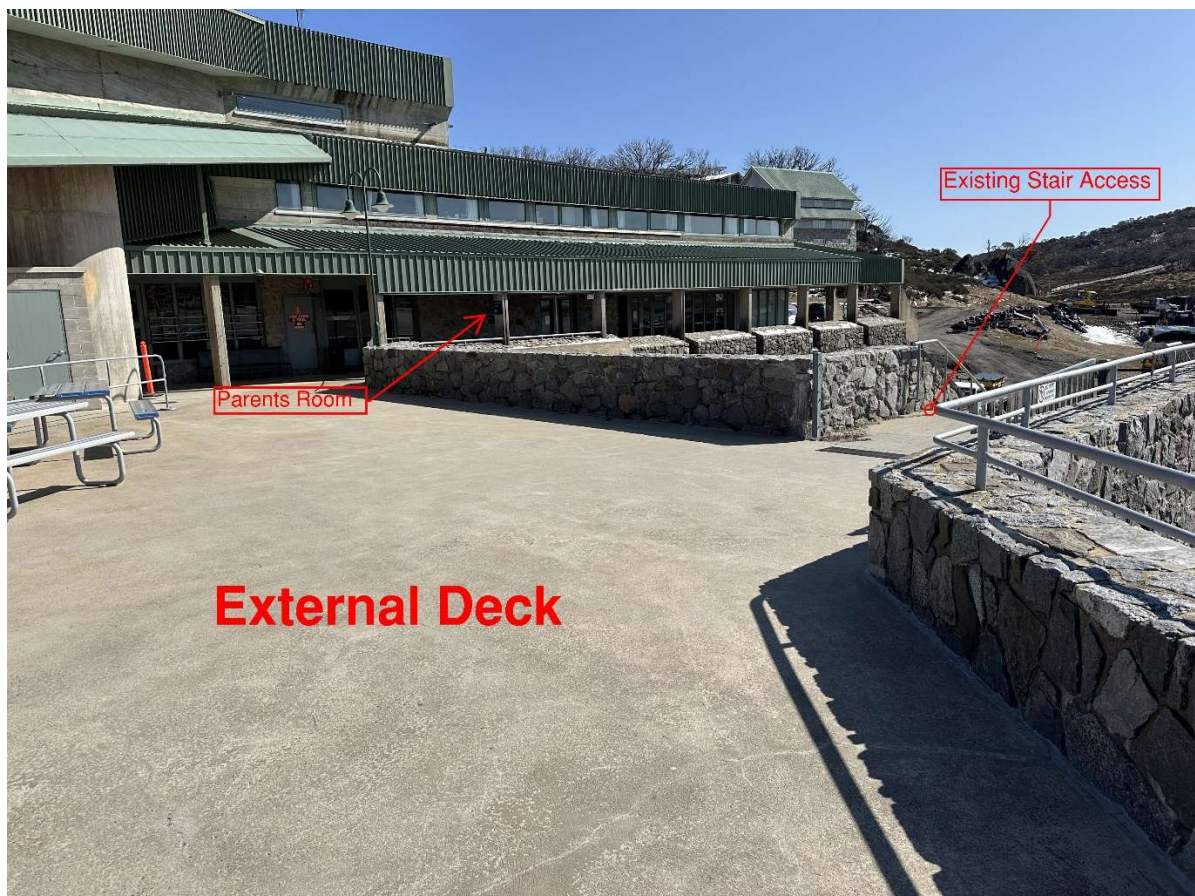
Perisher Centre external upper-level deck to be accessed via the proposed lift.
